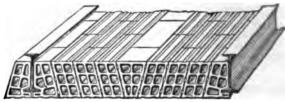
Horizontal floor-arch of hollow brick protecting beam flanges (Maurer's).
